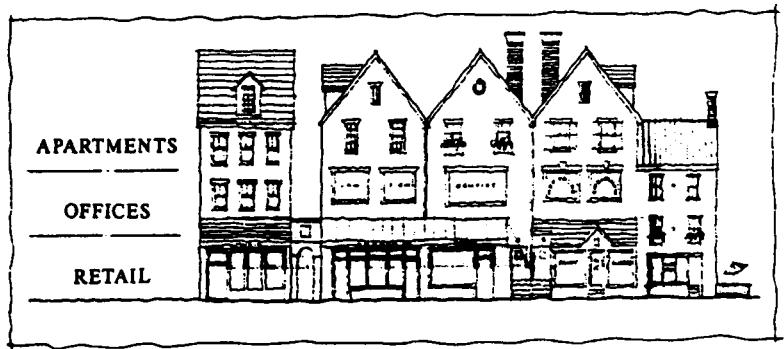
Multistory, mixed-use structures may contain retail uses on the ground floor, office uses on the second floor and apartment dwellings on the third floor.
